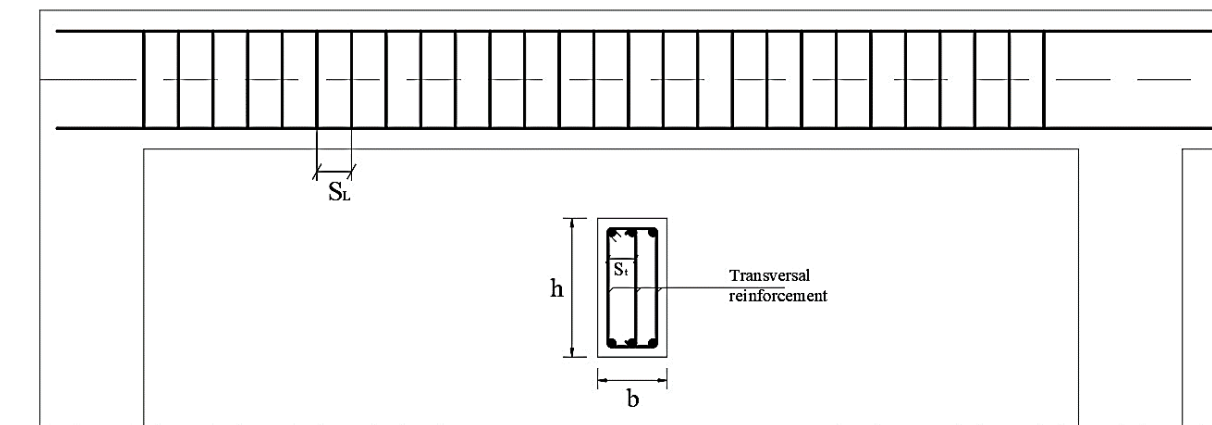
Maximum longitudinal and maximum transversal spacing of the stirrups
